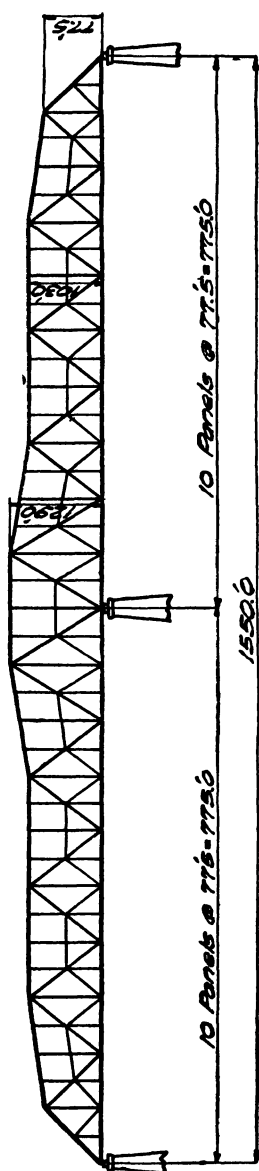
Layout of Subdivided-Triangular-Truss, Continuous Spans.
